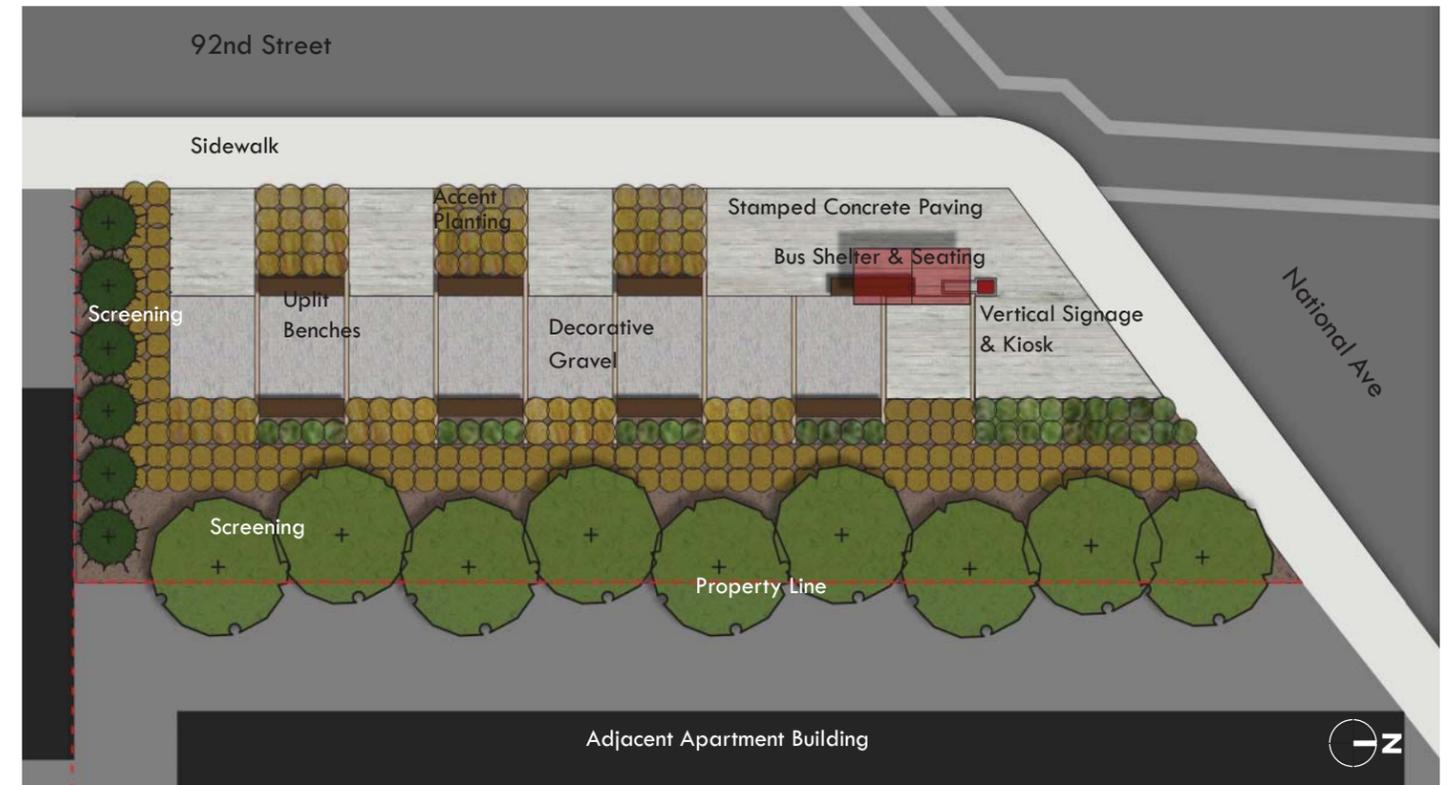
Conceptual site plan showing a new plaza with a variety of planting, paving, seating and artistic design elements.
